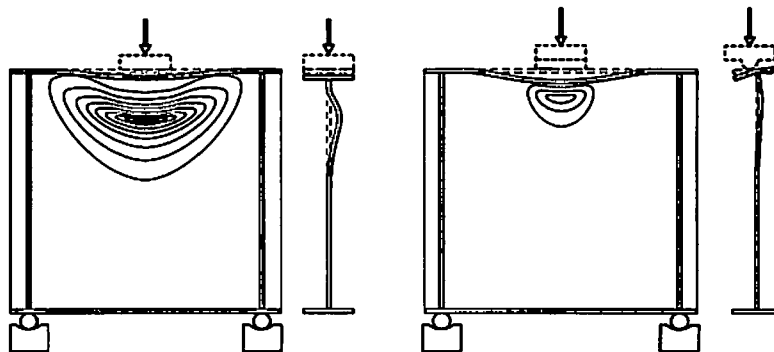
Difference between collapse forms of the centrally and eccentrically loaded girders.
